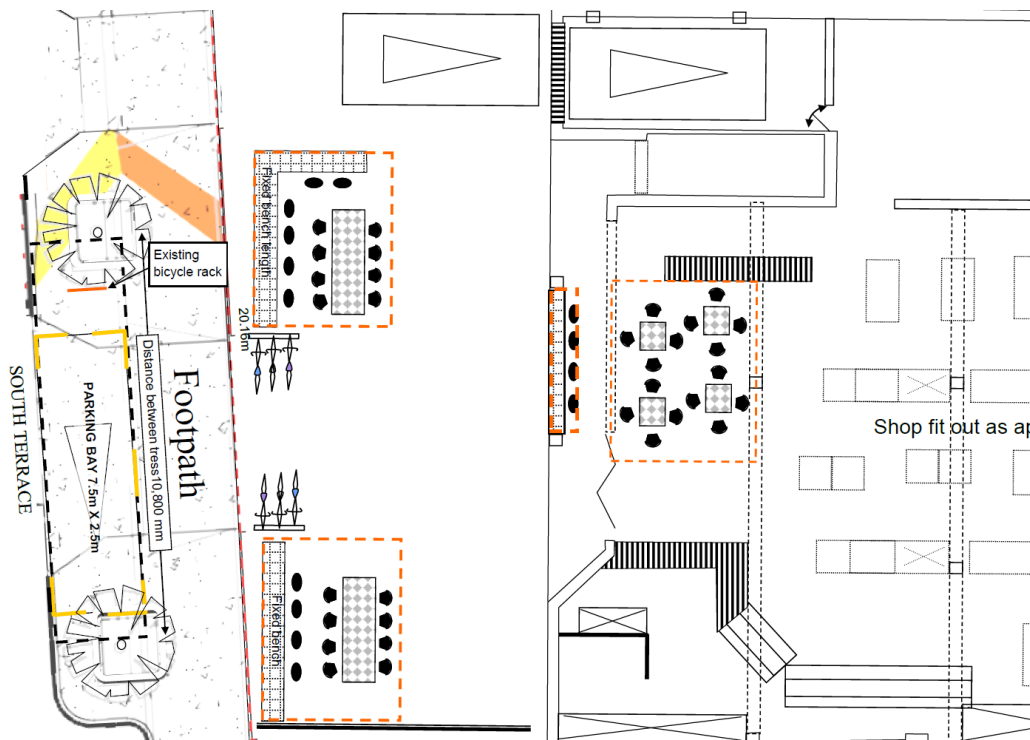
Option 2 - Retention of dining area as installed with one parking bay proposed to be located in verge
